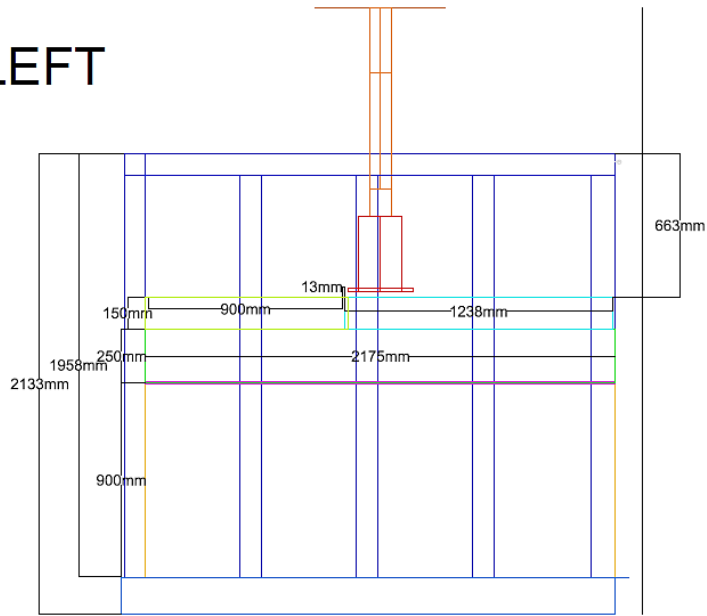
Large Box Layout with Concrete Slabs (Left View)
